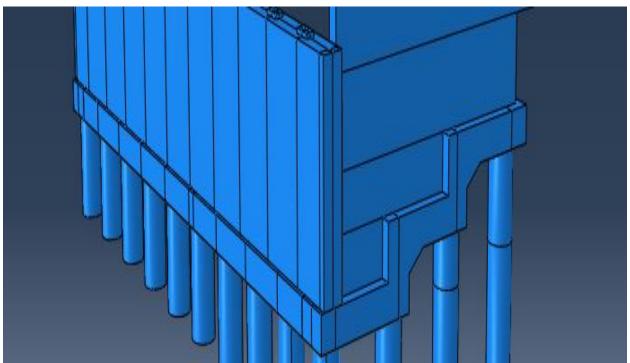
ABAQUS Finite Element Model of HAM-74-1466 bridge abutment.
